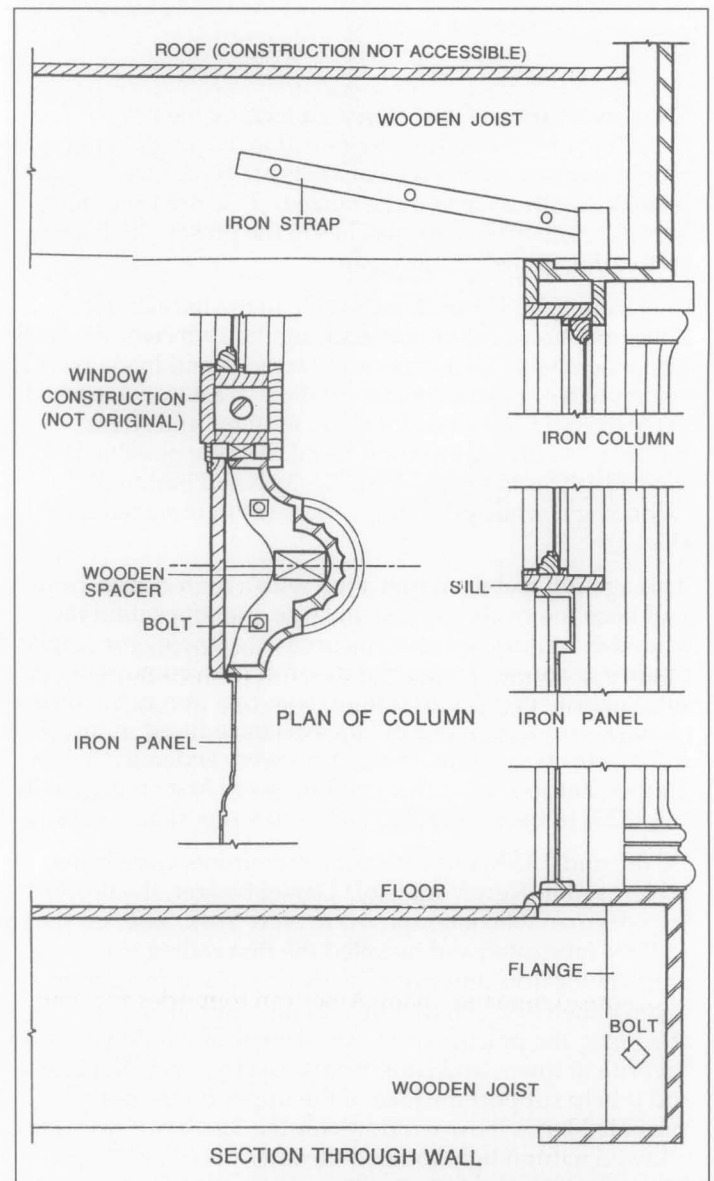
Section drawing through the wall of Edgar Laing Stores showing how the cast-iron facade components were anchored to the wood floor and roof framing members. Drawing: John G. Waite, HABS Collection.
